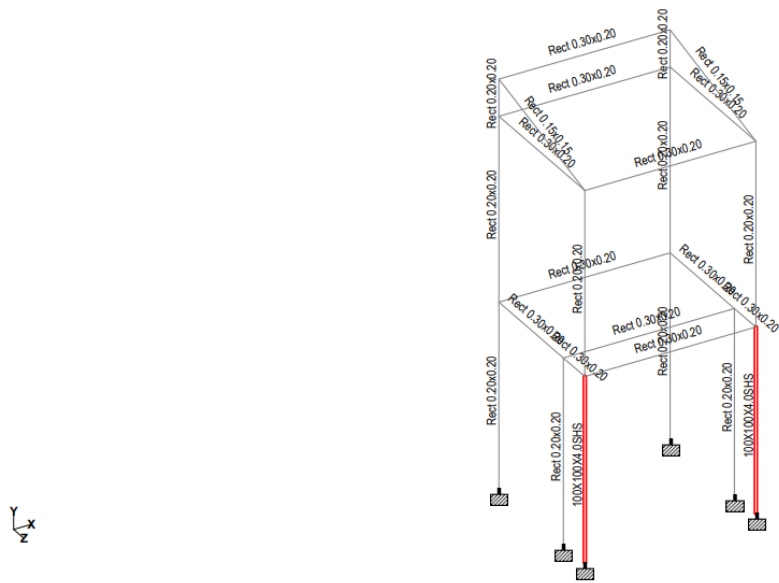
Steel strengthening entrance atmahudha timberlime structure
